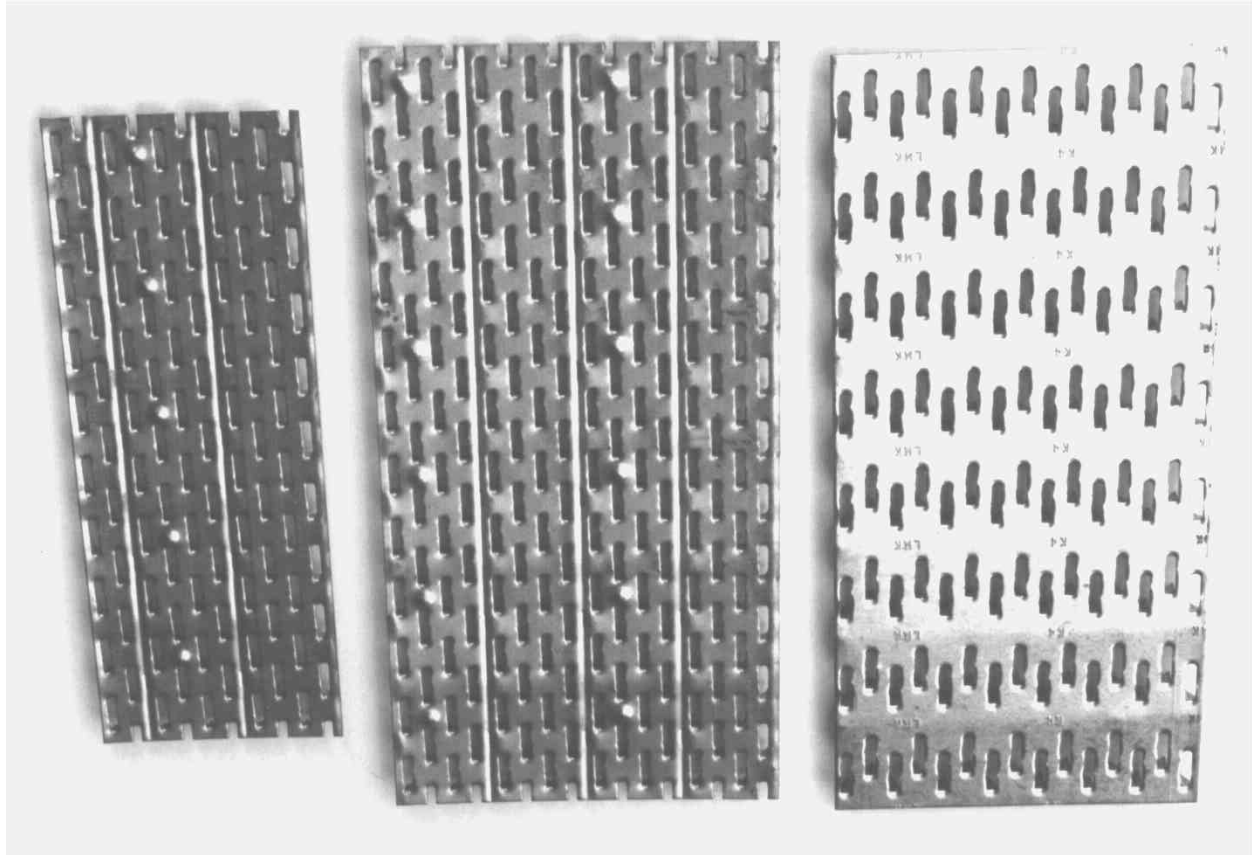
Photograph of the truss plates used in this study. Shown from left to right are an Alpine HS2510 20-gauge truss plate, an Alpine HS412 20-gauge truss plate, and a Lumbermate K510 16-gauge truss plate.
